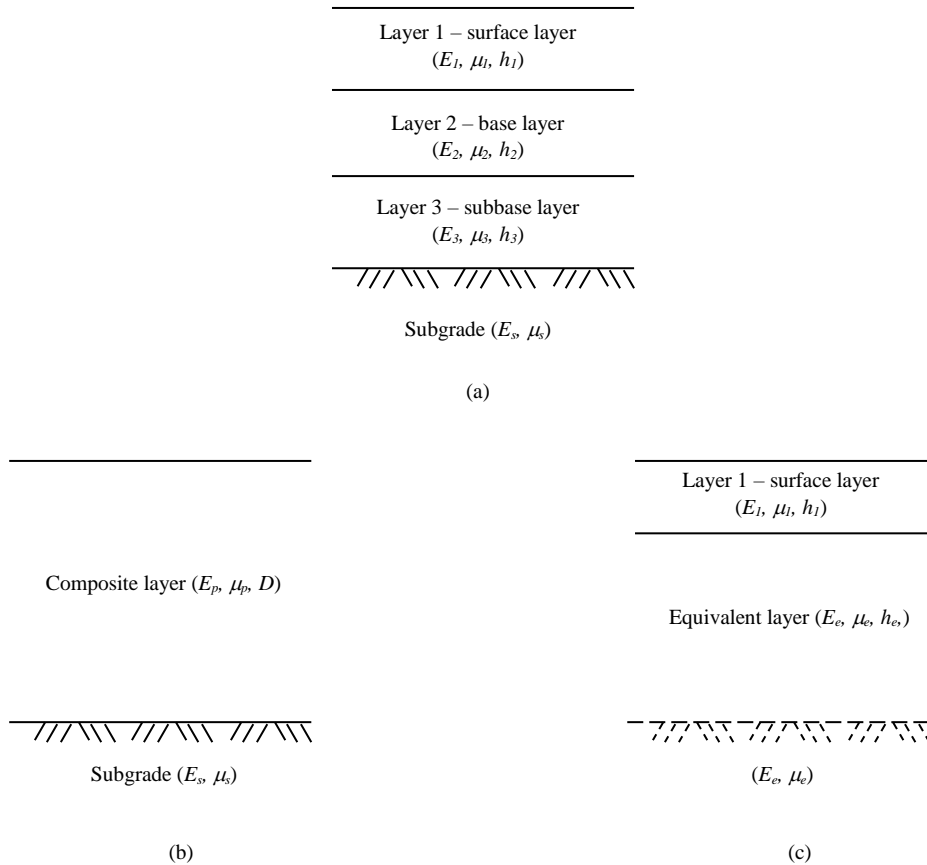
Pavement structural layers used in this study: (a) real structure in practice; (b) structural layers to determine E_s ; (c) structural layers to determine E_l
